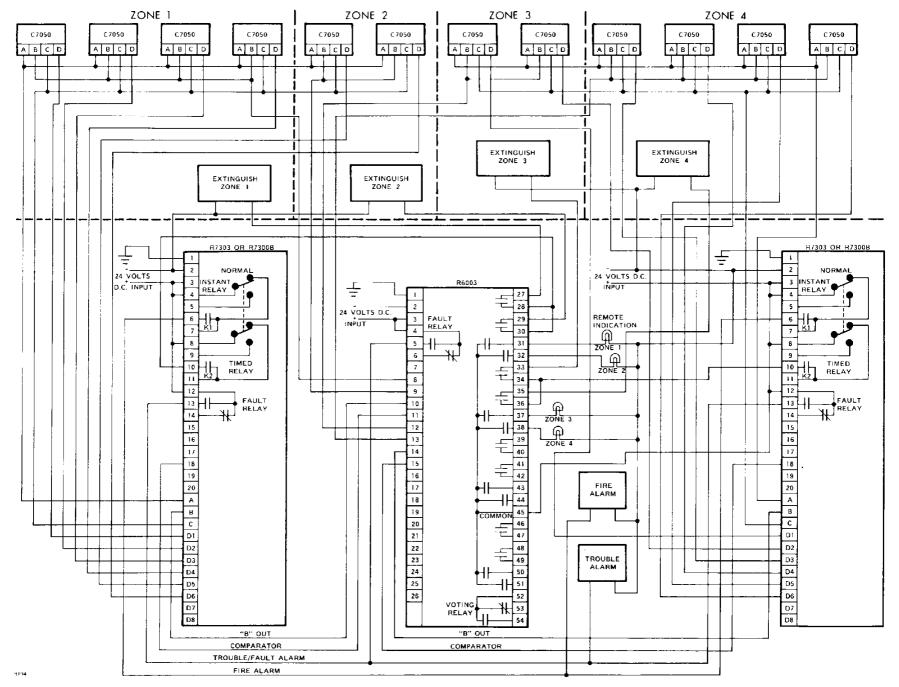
Typical System Using one R6003 Auxiliary Zone Unit and two R7303 (or R7300B) Controllers with Remote Indication
